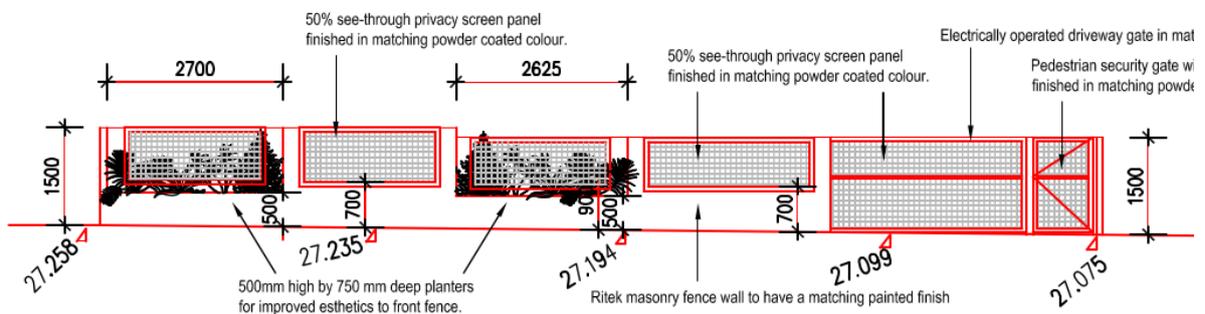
Extract of the front fence street elevation (source: Sabton & Son, drawing no. PR090.09 Page 04, dated 08/07/2020)
